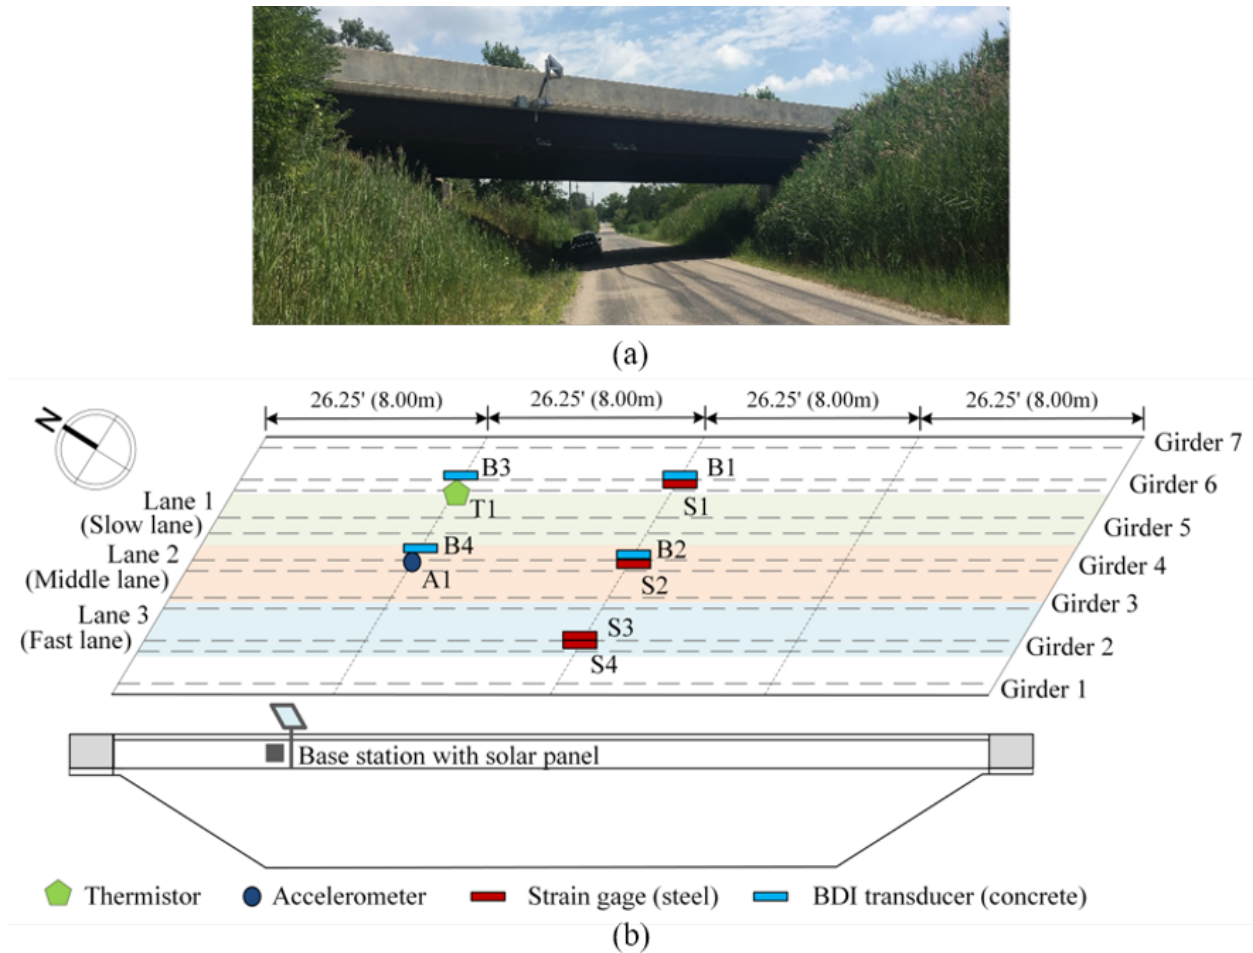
(a) Newburg Road Bridge carrying I-275 northbound traffic over Newburg Road; (b) overview of the wireless SHM system installed.
